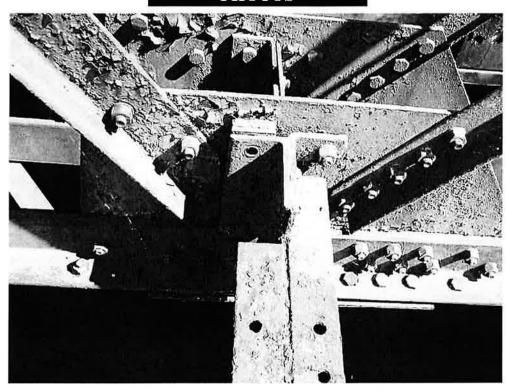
South tower outer truss at node L10, looking north: the diaphragm angle connection (also serves as outer connection angle for the utility support bracket) has a sheared / missing connection bolt.
